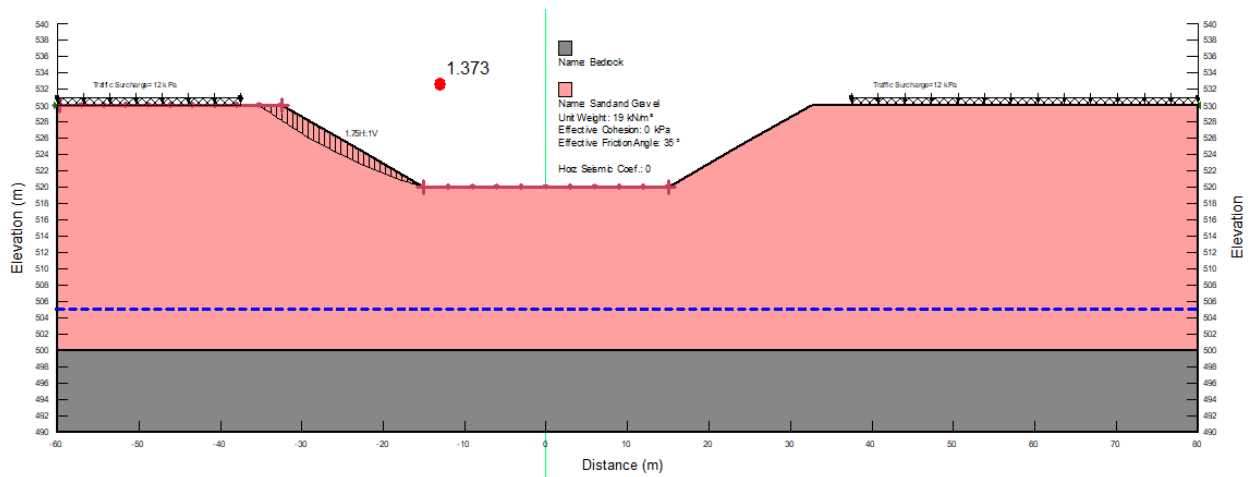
1.75H:1V Cut Slope of 10m-High Headscarp Based on LiDAR Survey Data under Static Loading Conditions.
